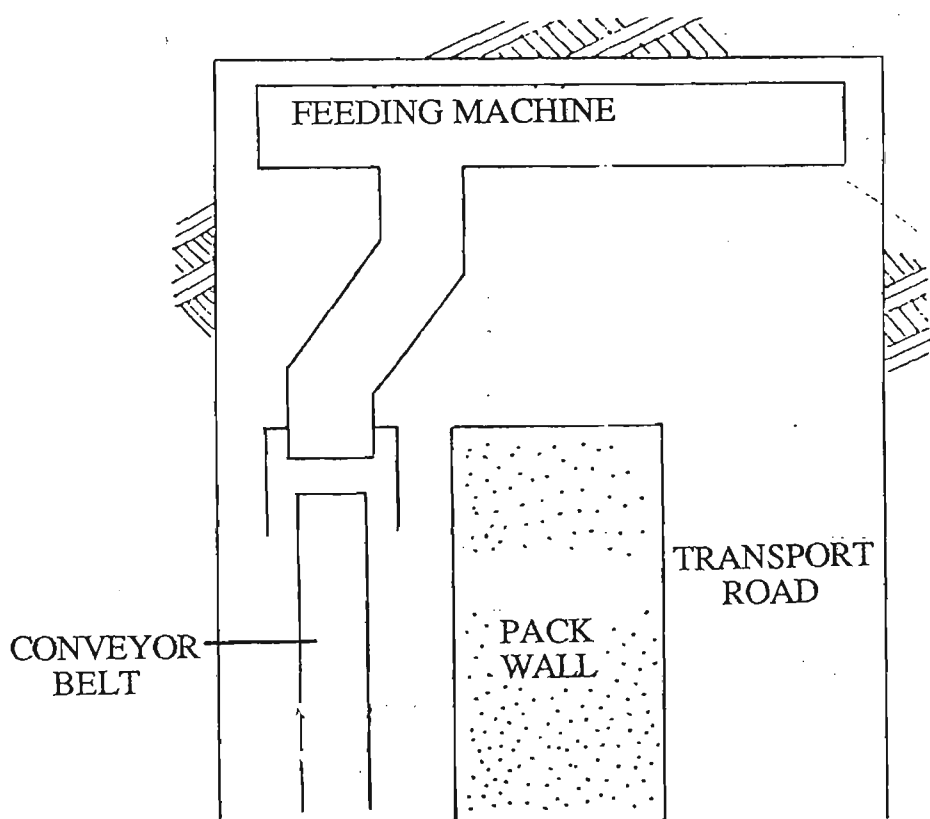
(a) Concept of single entry dividing wall - driveage layout.
